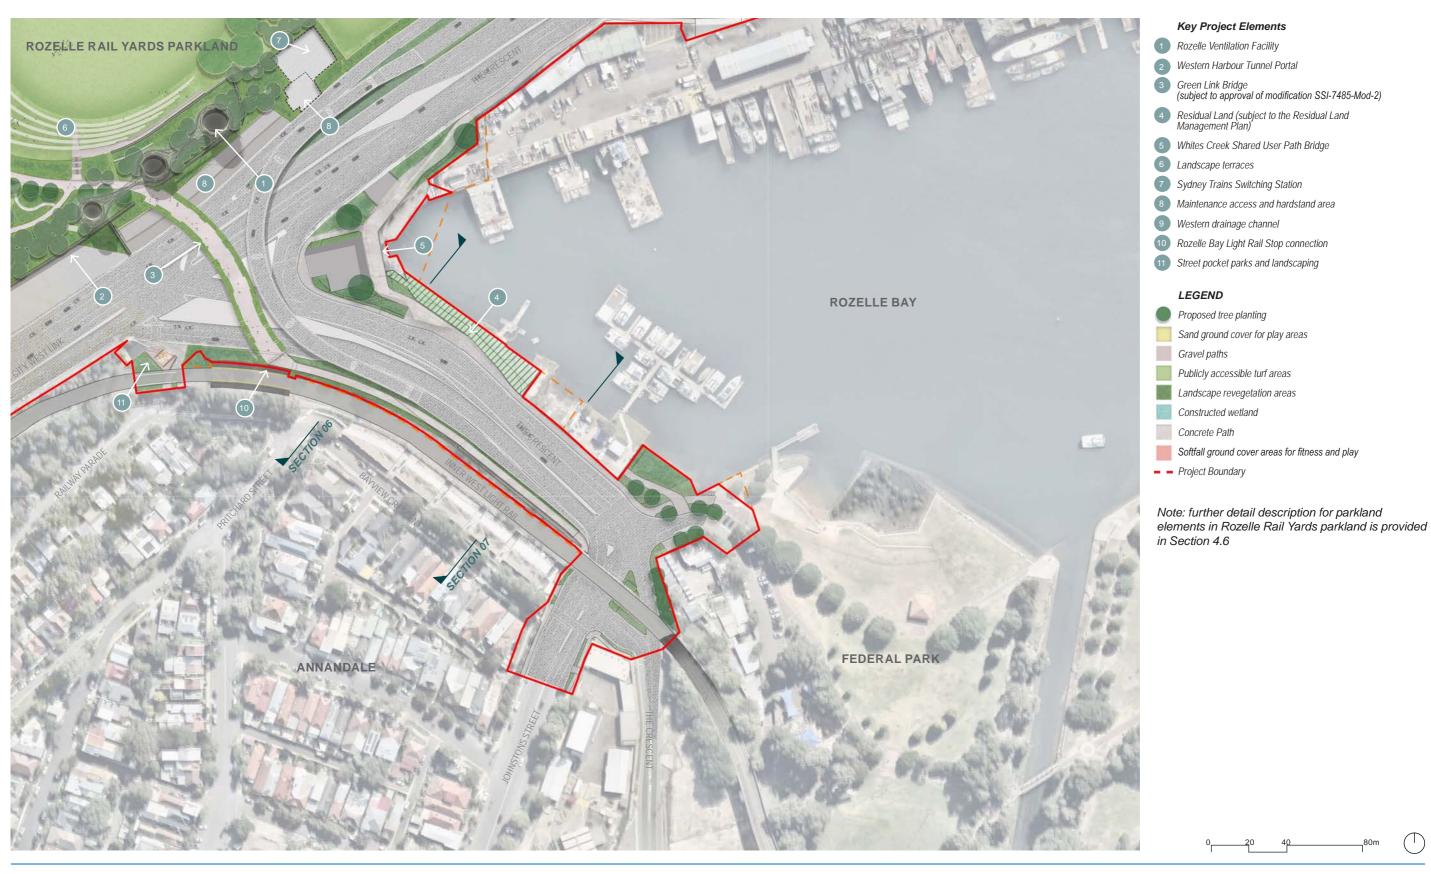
Rozelle - Concept Plan - Drawing 4 of 4
